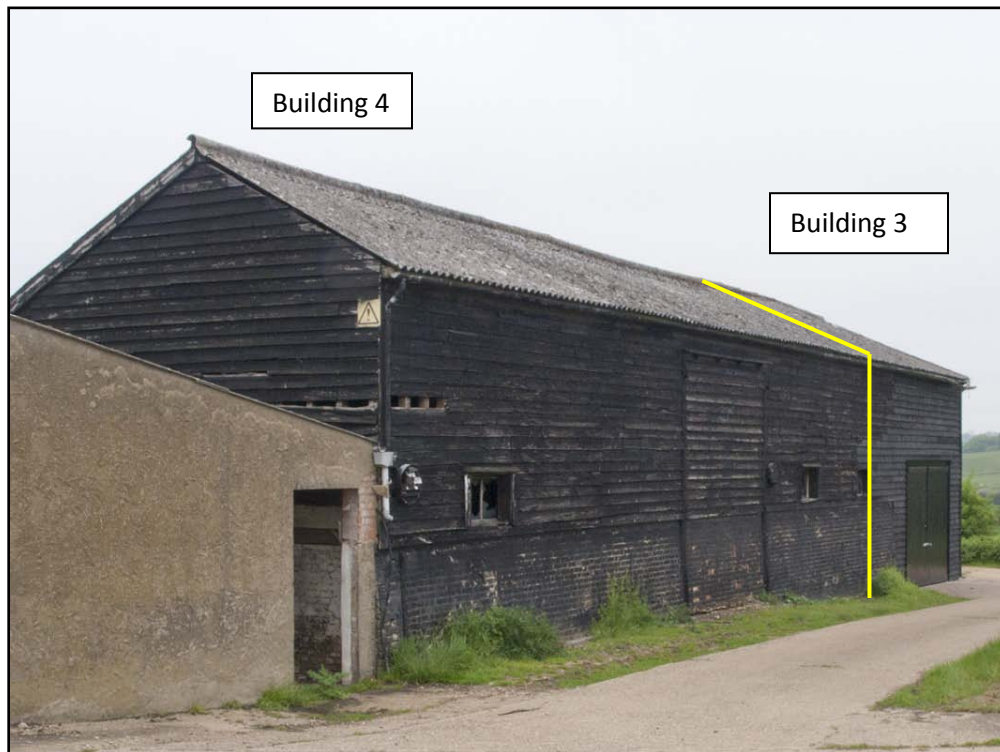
West elevation (left) of Building 4 and south elevation of Buildings 6 (left), 4 (centre) and 3 (right), viewed from the south-west
